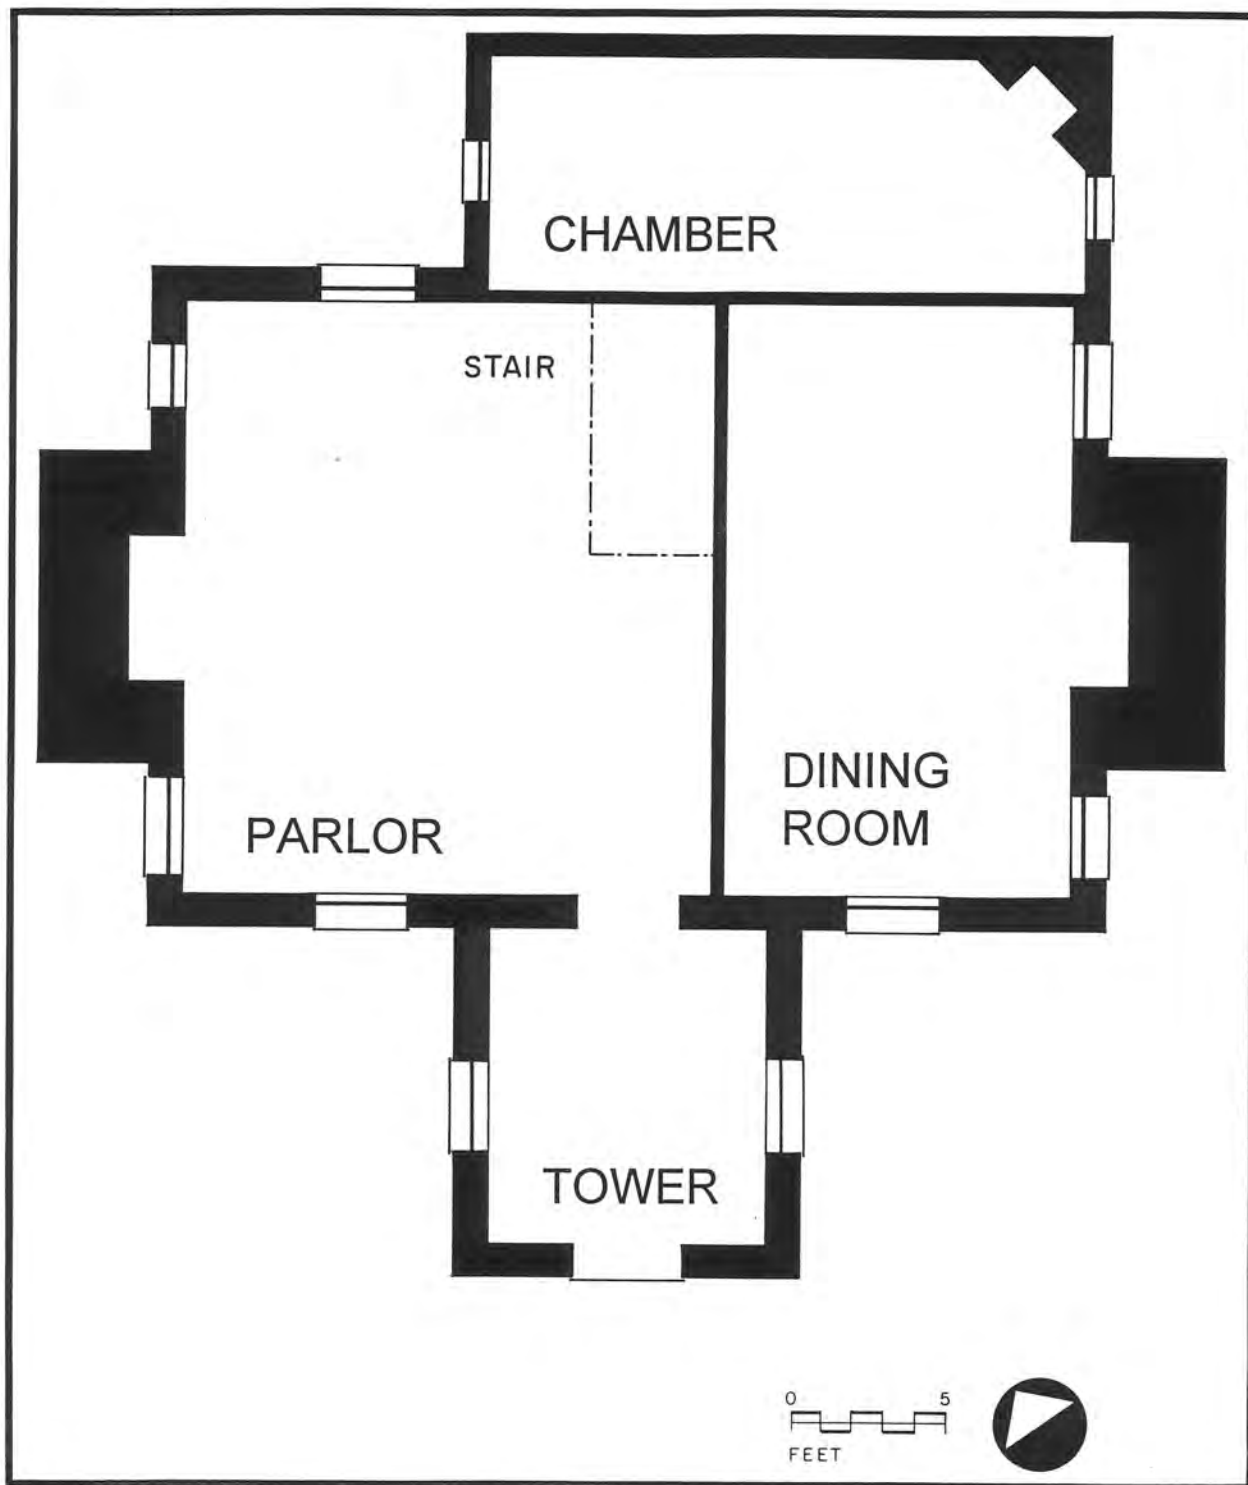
Matthew Jones House, first-floor plan in its Period II (1730) form.
